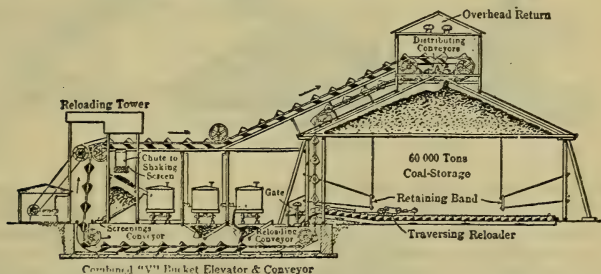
Erie Railroad covered storage and transfer plant, Hammond, Ind. Cross section.
